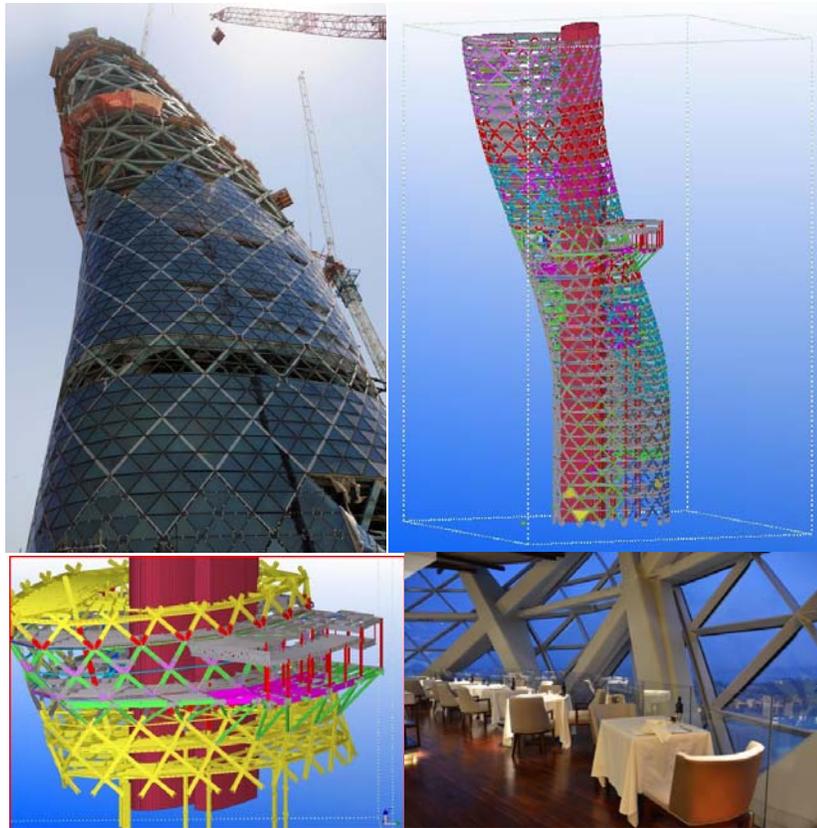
Capital Gate: The construction of the tower (top left)⁸; Tekla diagram of the entire tower revealing the concrete core (top right)⁹; Tekla drawing of the structure at the 18th floor, restaurant level and pool projection on the 19th floor (bottom left)¹⁰; interior view of the restaurant on the 18th floor illustrating the presence of the architecturally exposed welded steel diagrid frame.
